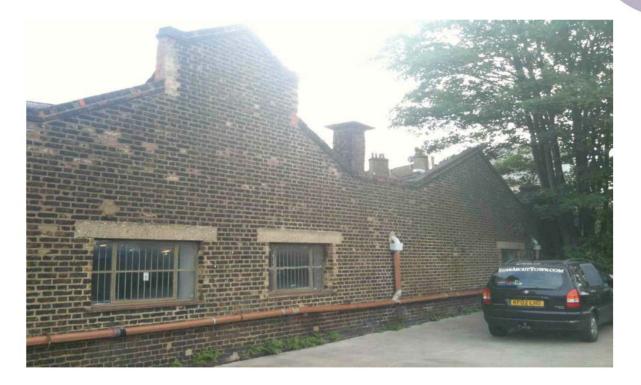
Rear elevation (south west) of 1A Highgate Road
